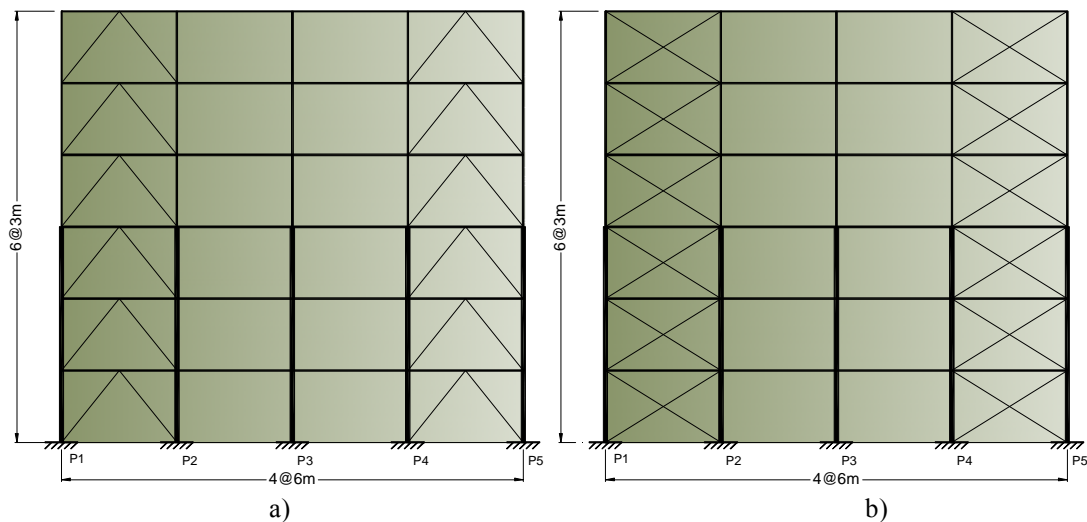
Elevation of the periphery frames: (a) K-bracing; (b) diagonal X-bracing.
